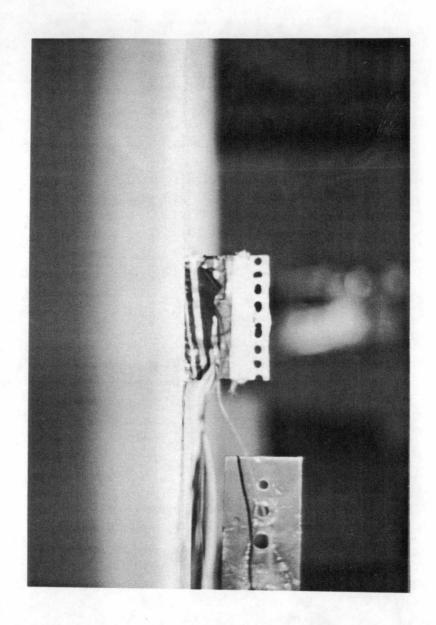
Mode of Failure of a Connector Embedded in Concrete Blocks
